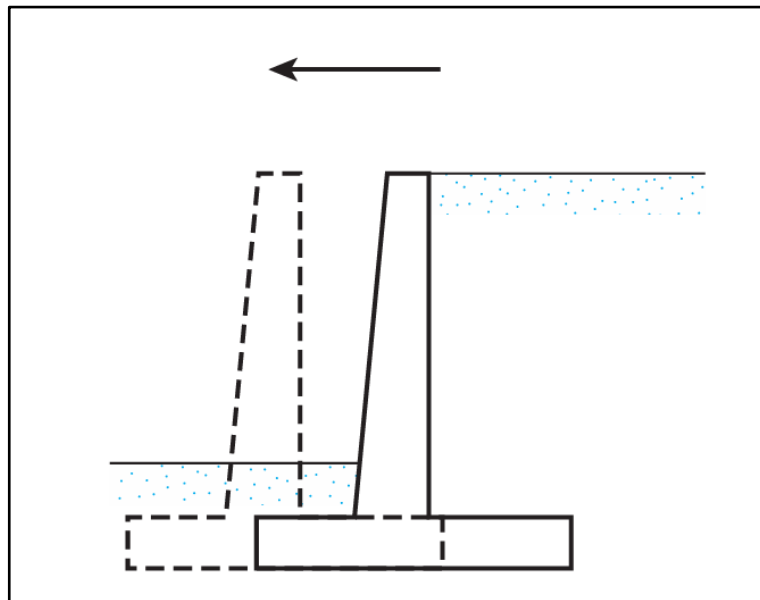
12 Sliding Stability Failure of Retaining Wall (Das, 2011)
